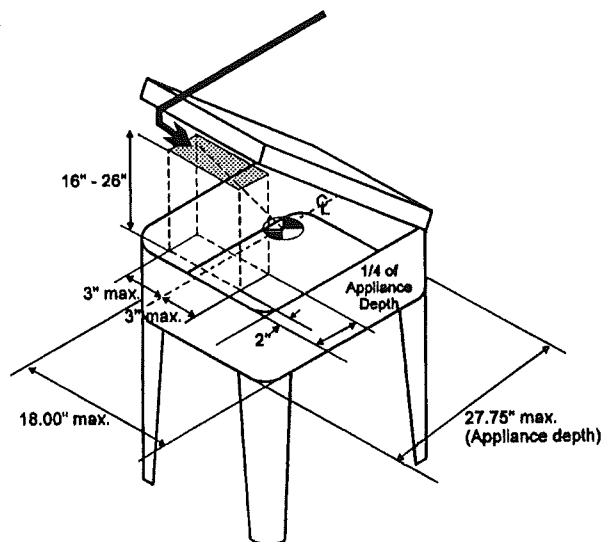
Model NL-FL2 Nozzle Placement, Tilting Skillet/Braising Pan.
